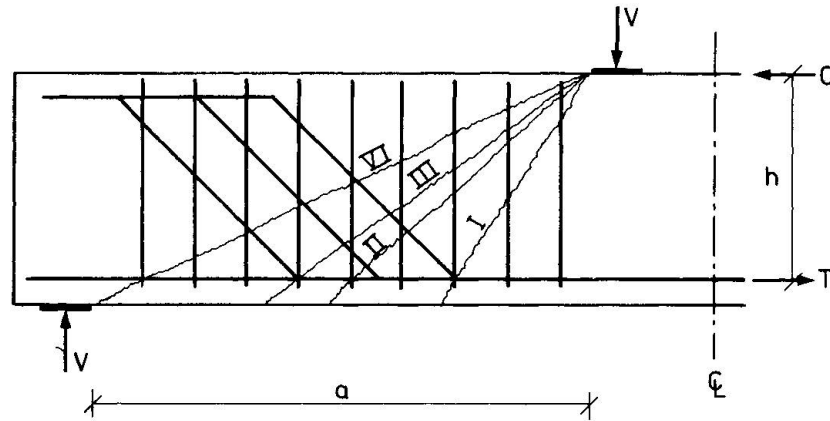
Reinforced Beam with Stirrups and Bent-up Bars.
